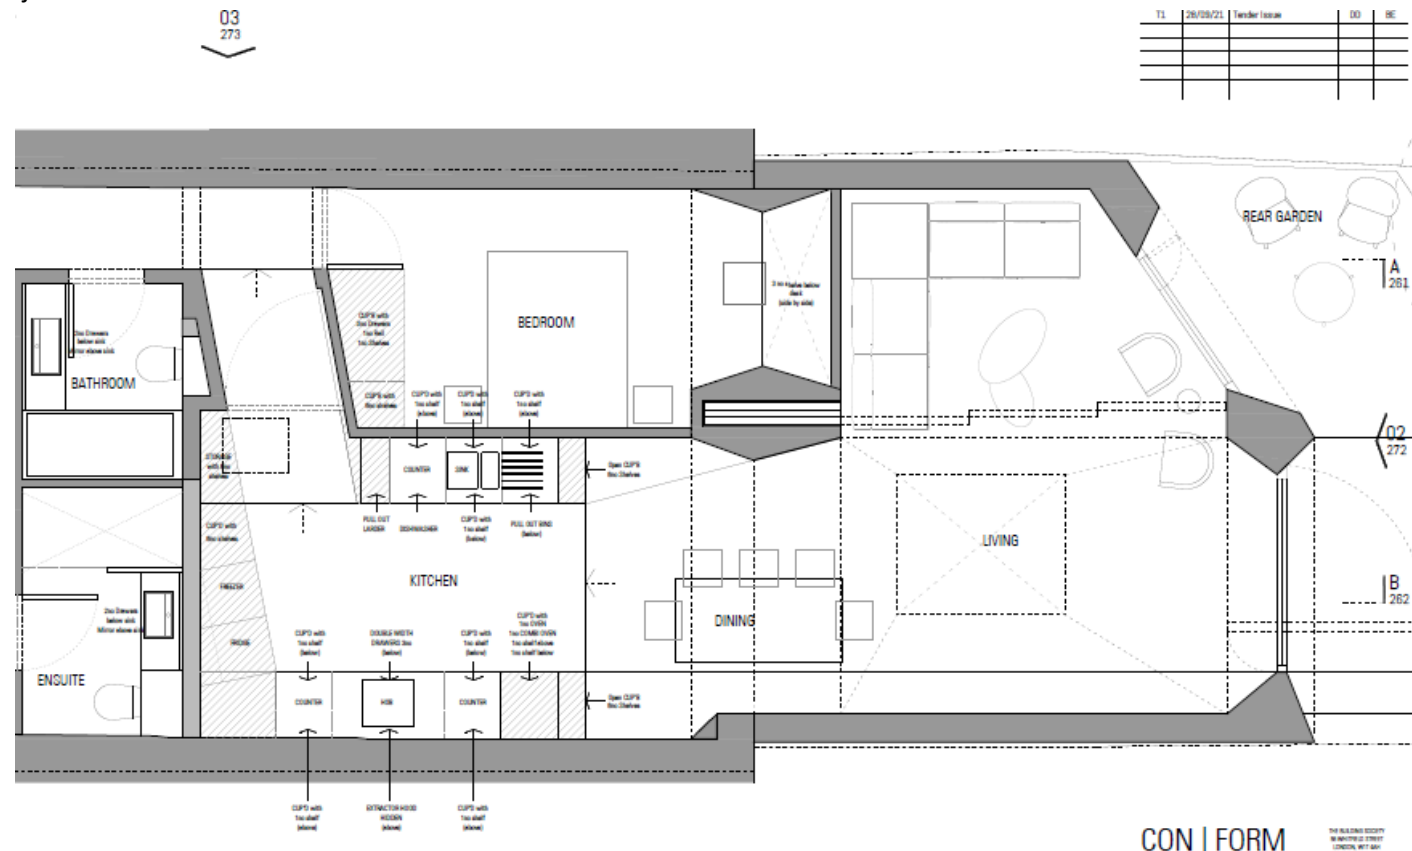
The proposal incorporates skylight and large glazed doors to the garden and as such there are not considered to be issues associated with shade on this project.
